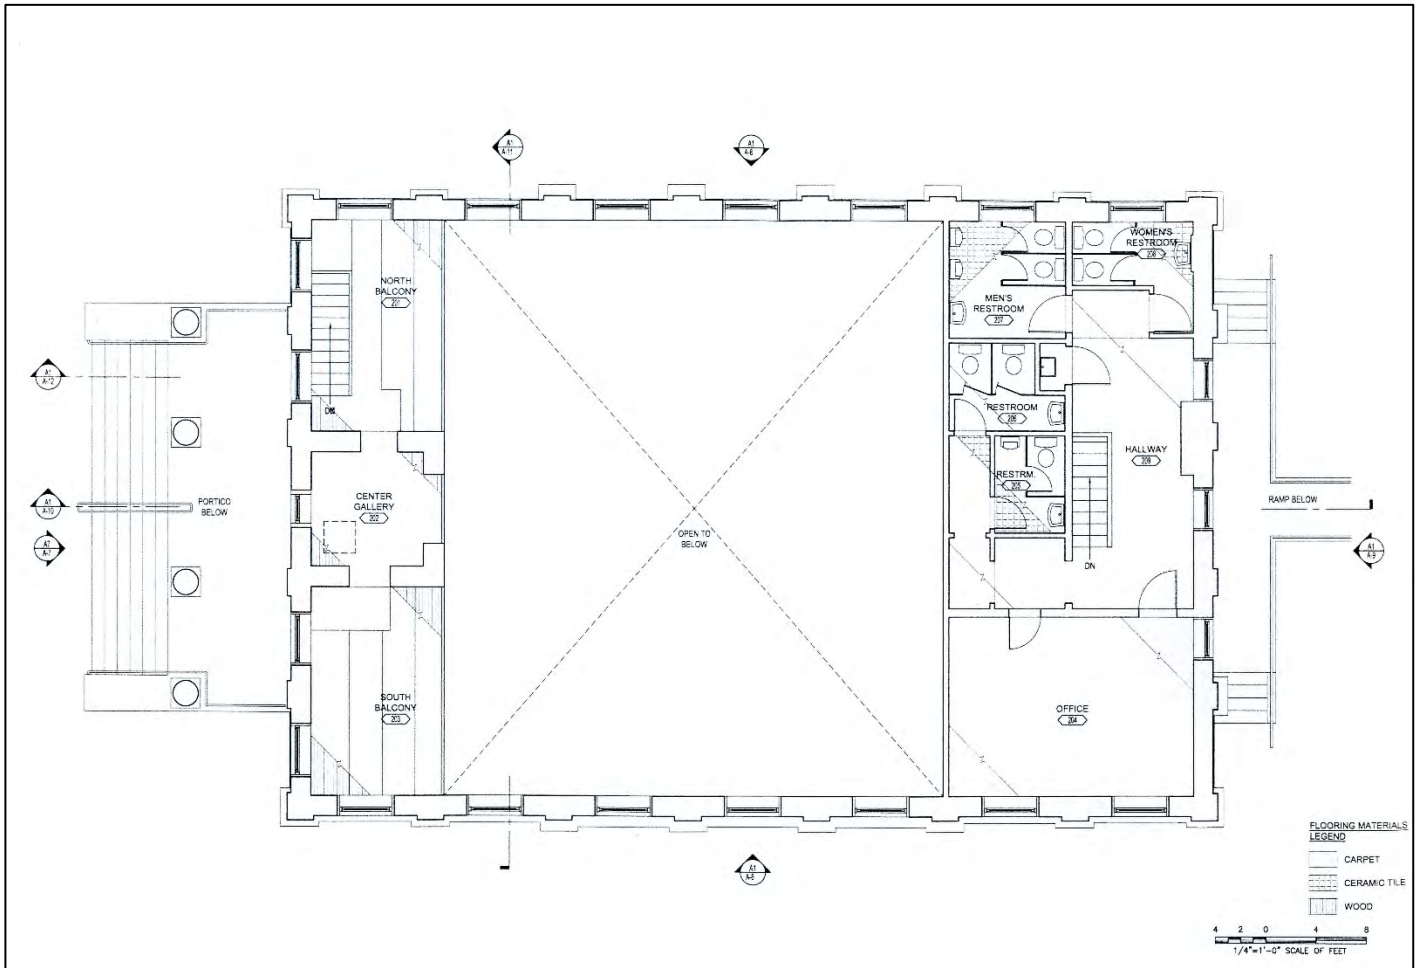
Second Floor Plan, Leesburg County Courthouse (Quinn Evans, 2008)
